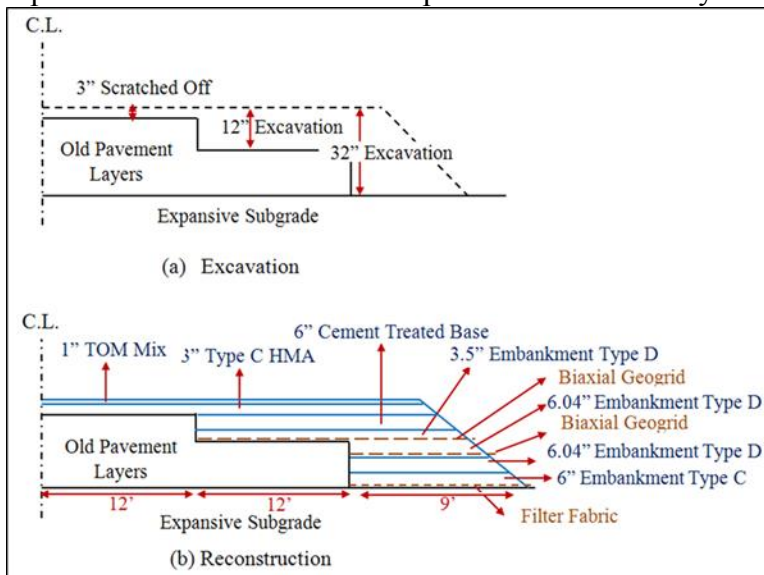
Detailed sketch of excavation and rebuild of SH-21
